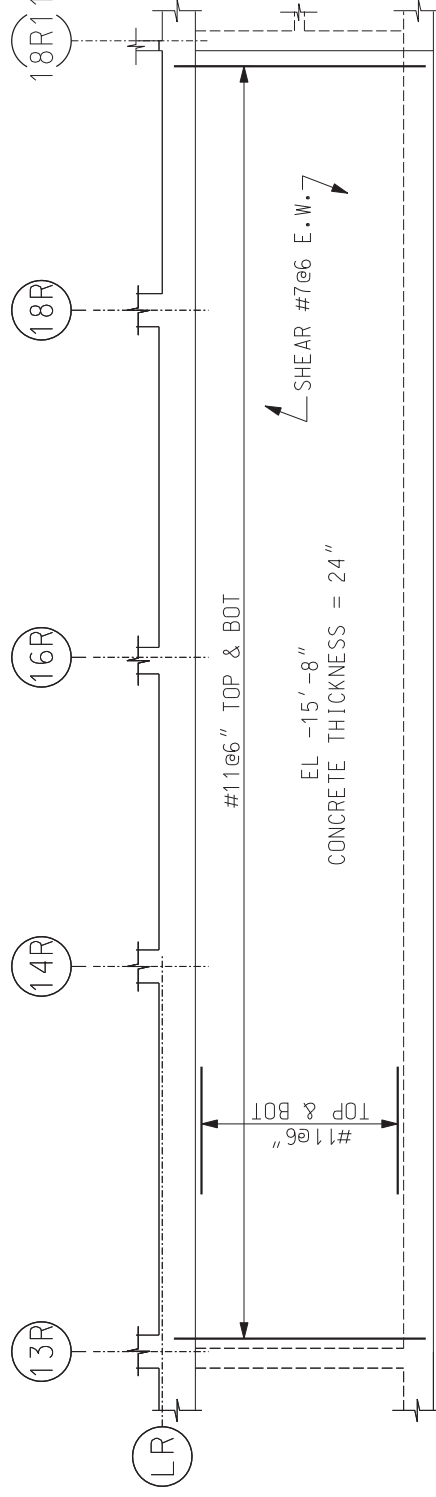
Typical Reinforcement in Slab at Elevation -15'-8" – AREA 1
